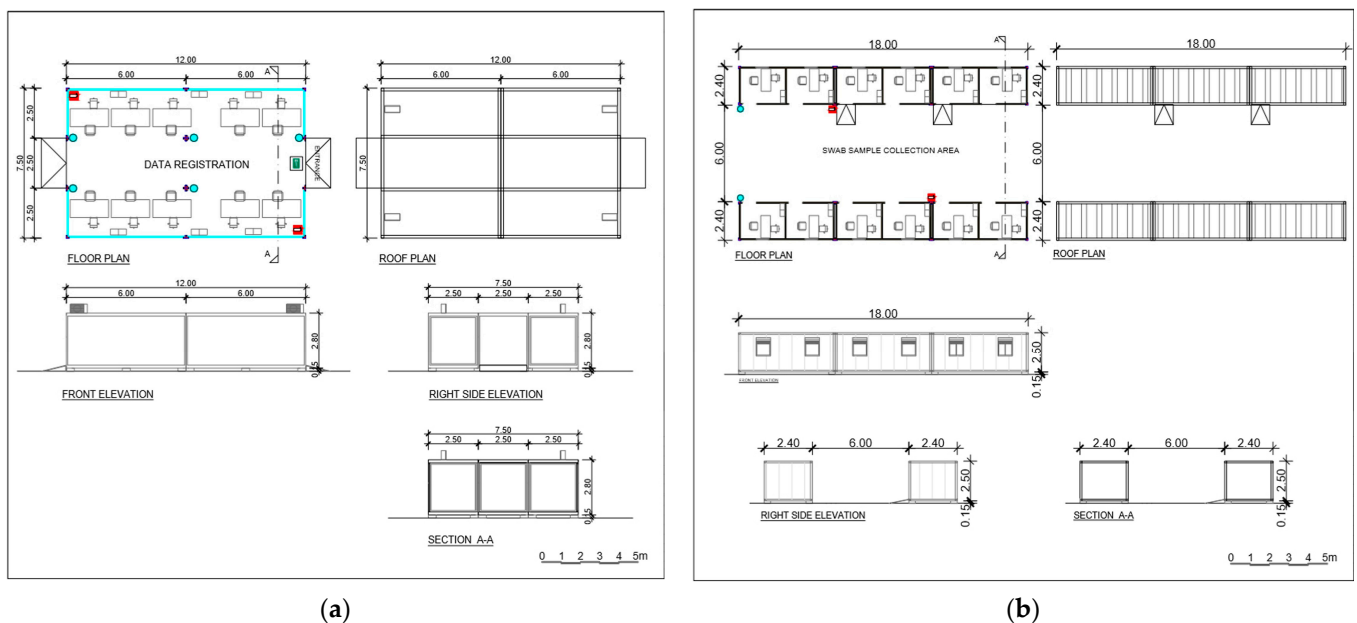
COVID-19 departure test center: floor plan. (Source: Ecolog International GmbH).
